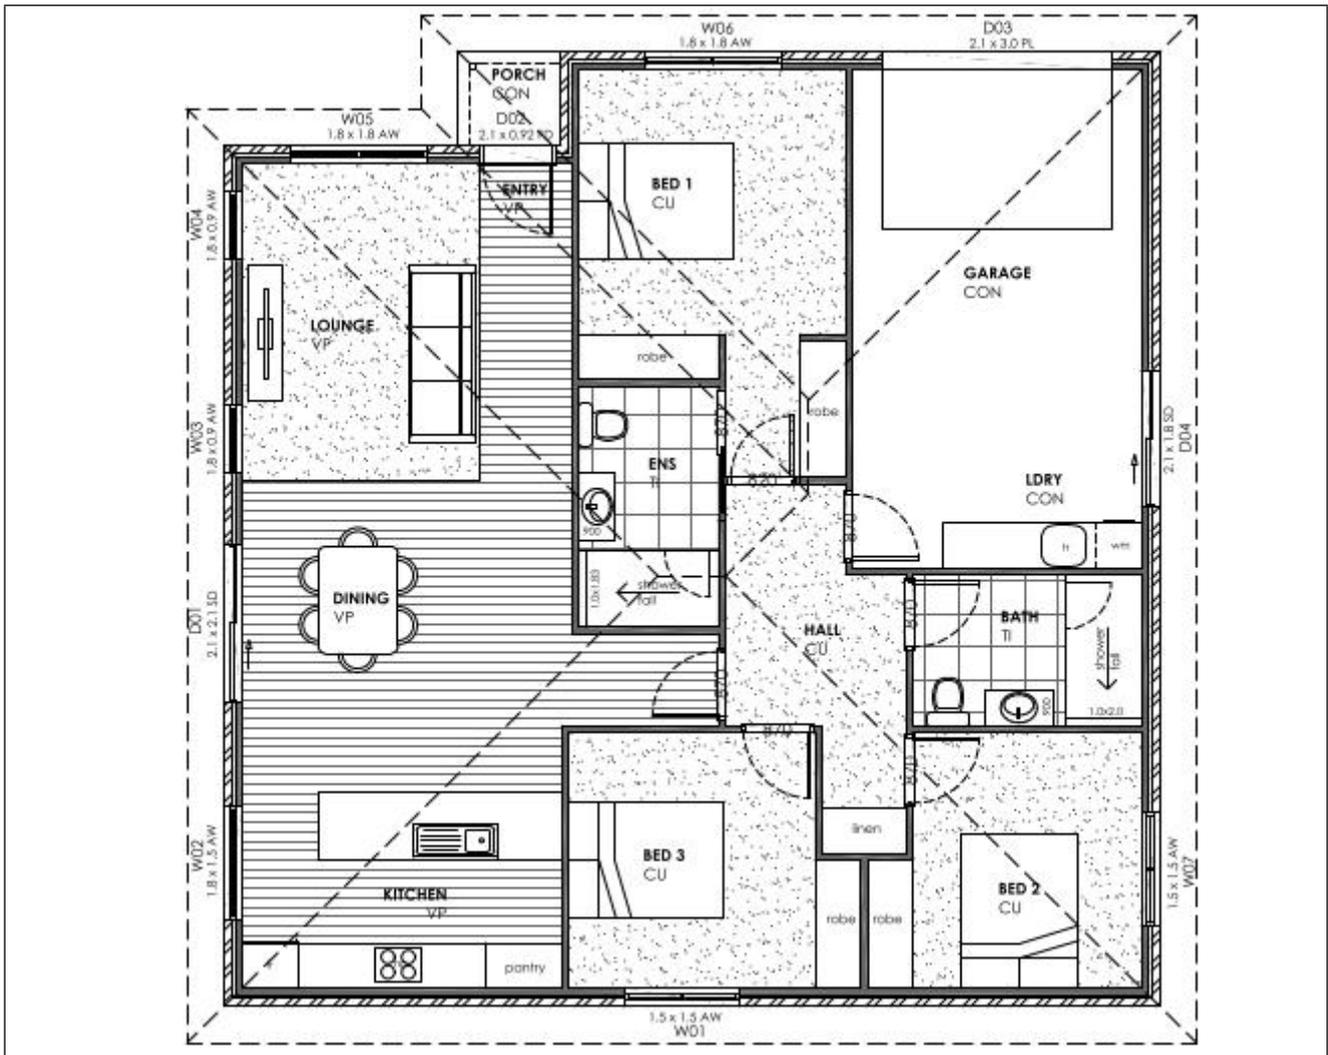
Floor plan (Source: RFS Projects Pty Ltd)
